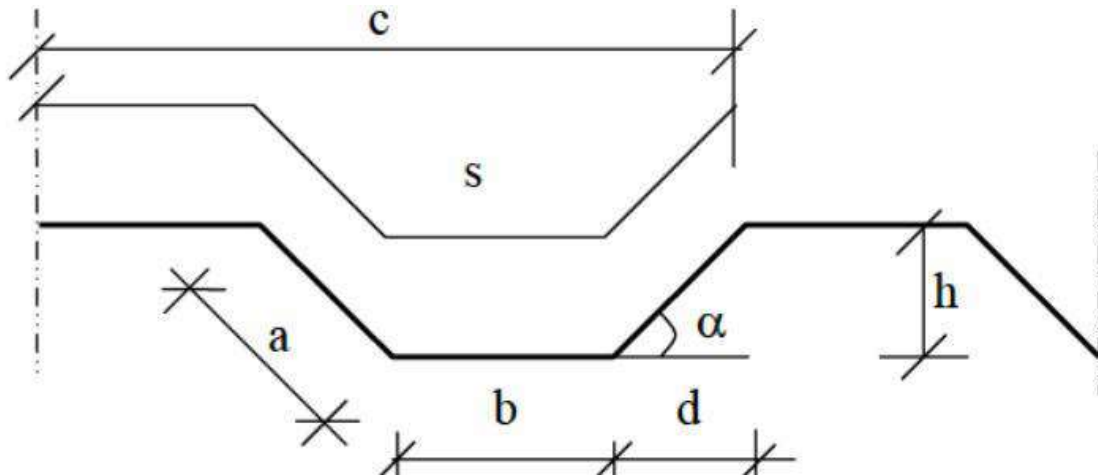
a) Trapezoidal Corrugated plates Design Consideration
